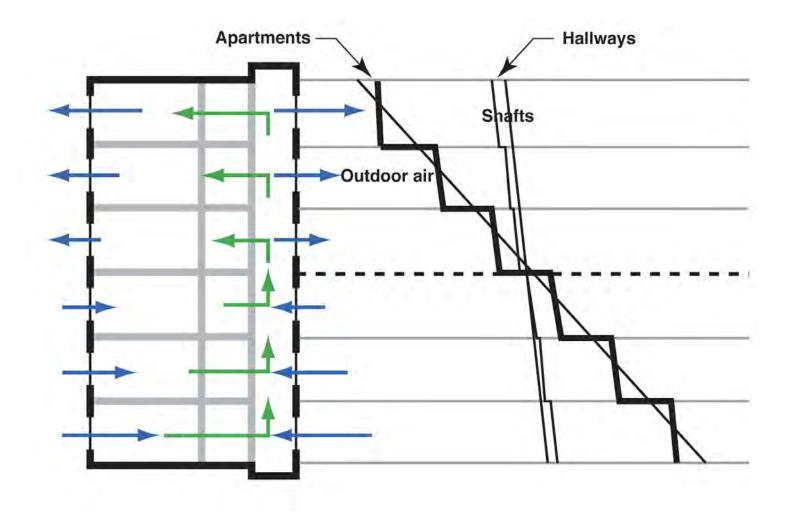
Apartment building with tighter apartment entry doors (Adapted from G.O. Handegord, 1998)
